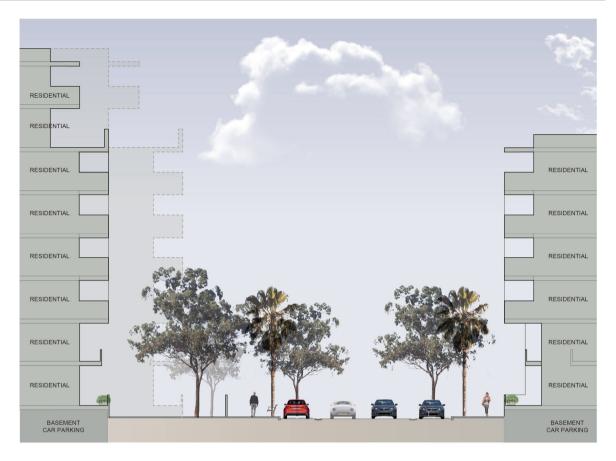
Typical street section 4 - River Road
